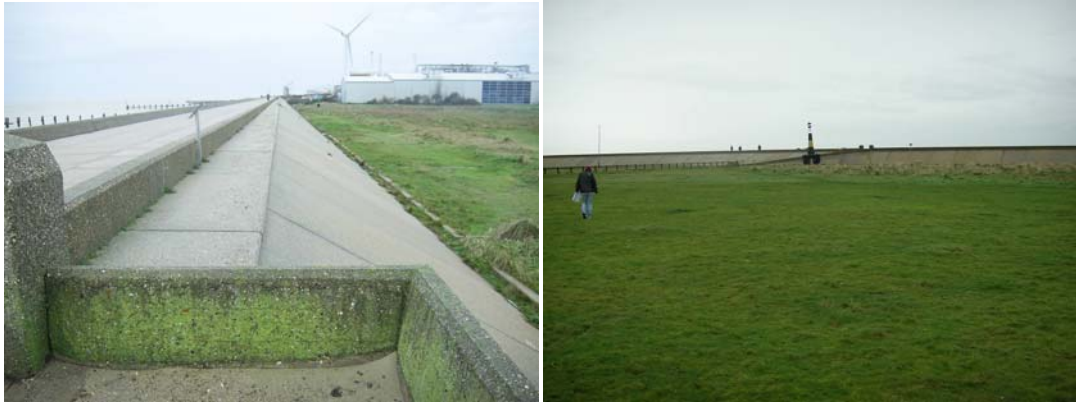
SEA WALL IN NORTH LOWESTOFT. VIEW OF THE ABOVE SEA WALL FROM THE INLAND SIDE. THE WALL IS PROVIDING COASTAL FLOODING PROTECTION TO INLAND AREAS.
